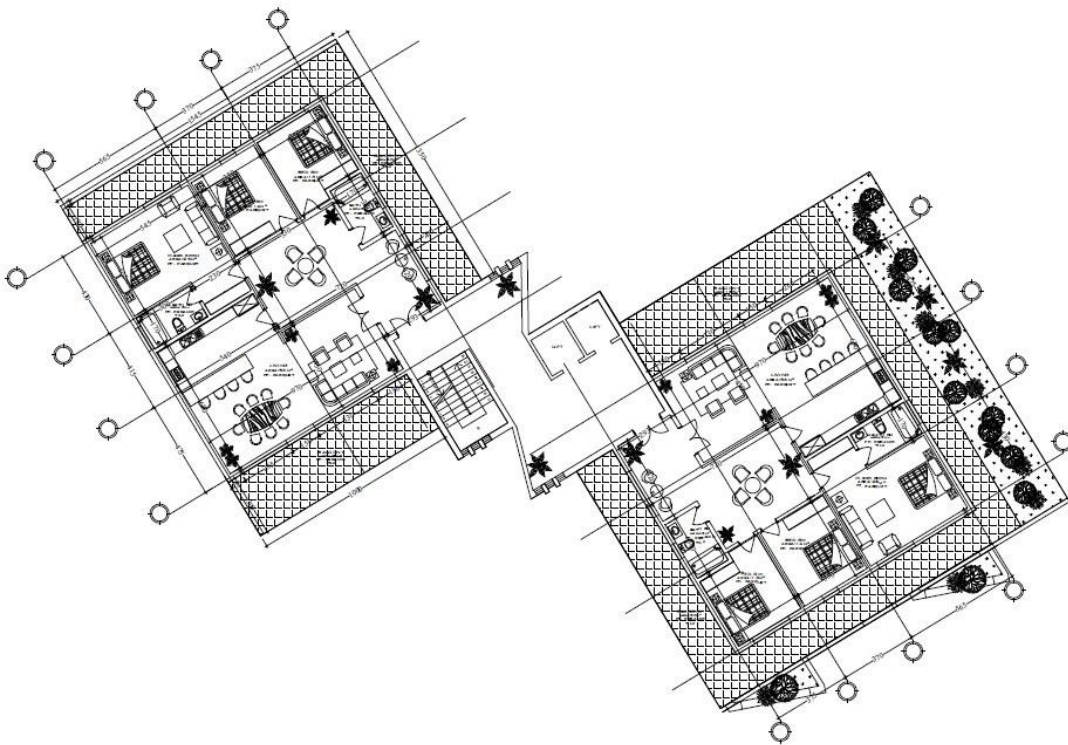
Floor Plan of 4th, 7th, 10th, 13th, 16th, and 17th of the proposed integrated vertical farming apartment building
